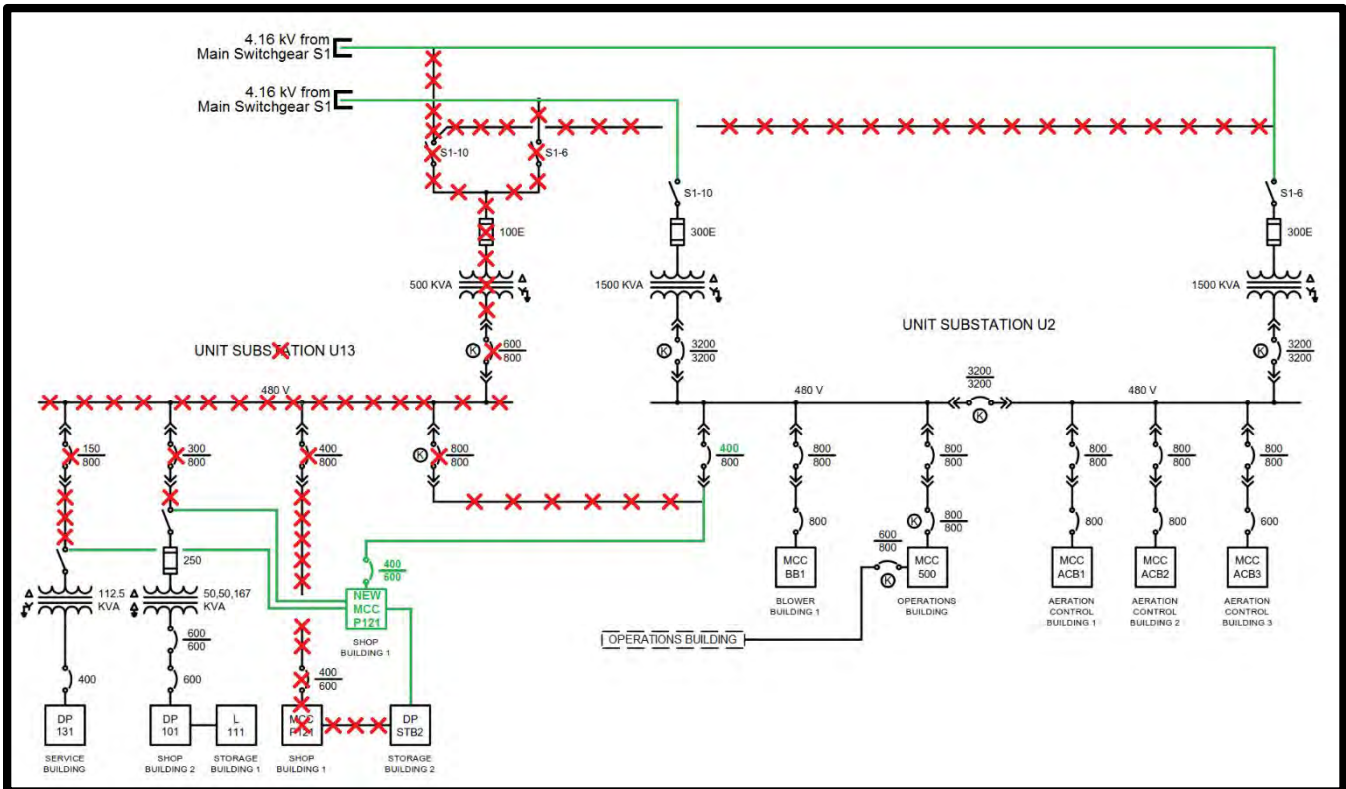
Alternative USUB No. 2—Unit Substations U2 and New MCC-P121 Feeders
